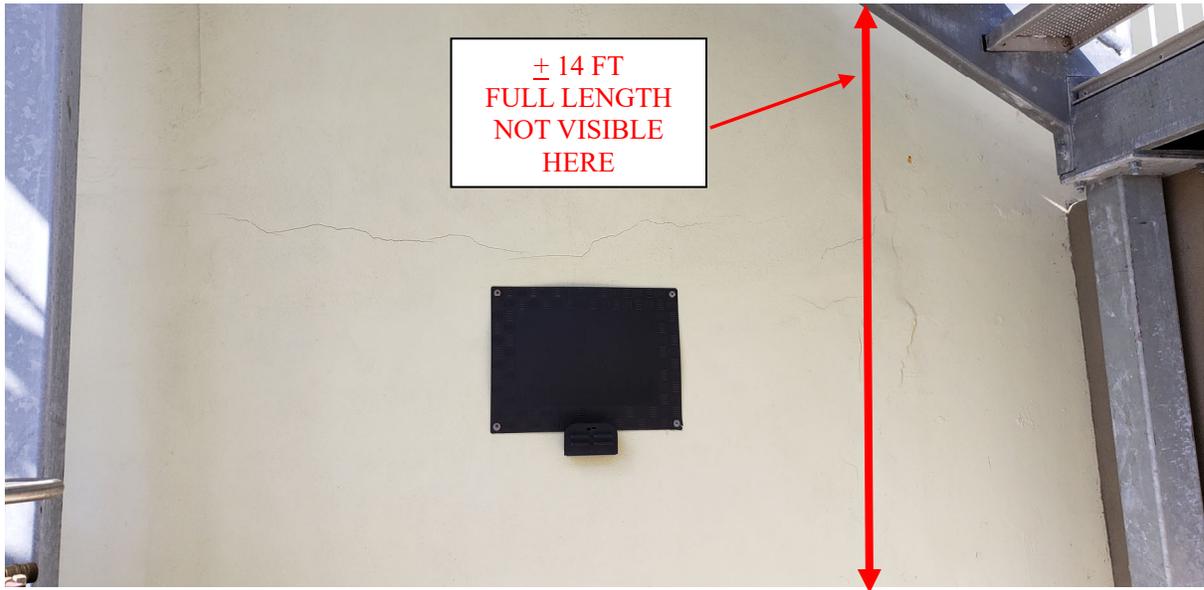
Location 21: Approximately 14 ft long new 16x8 concrete column. See detail /S104.
